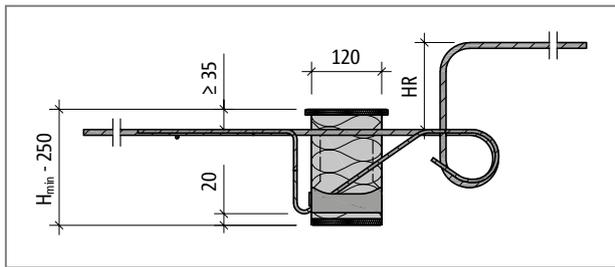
Schöck Isokorb® XT type K-HV: Product section
